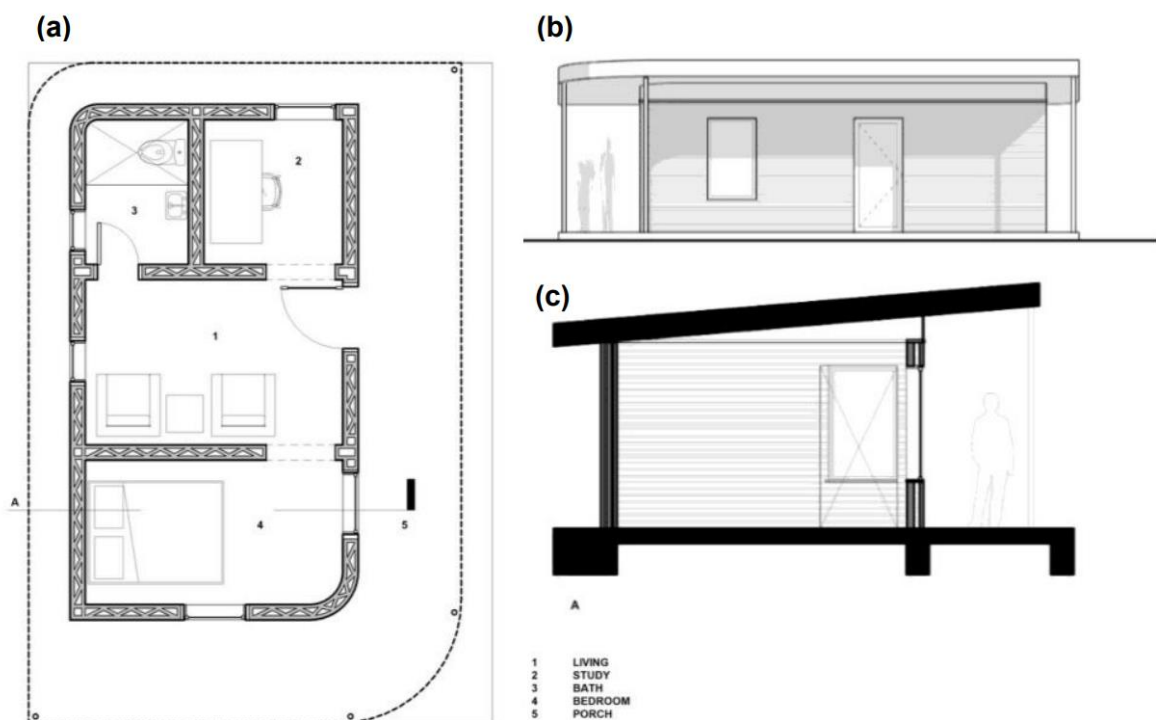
Plan, Section and Front Elevation of the printed houses[23]
